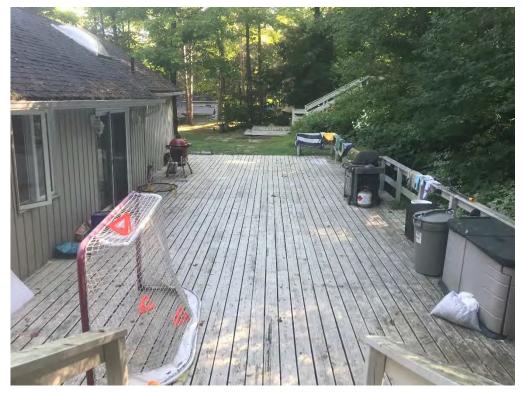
Existing deck at rear of 3248 Papineau Lake Road building (August 24, 2021).
